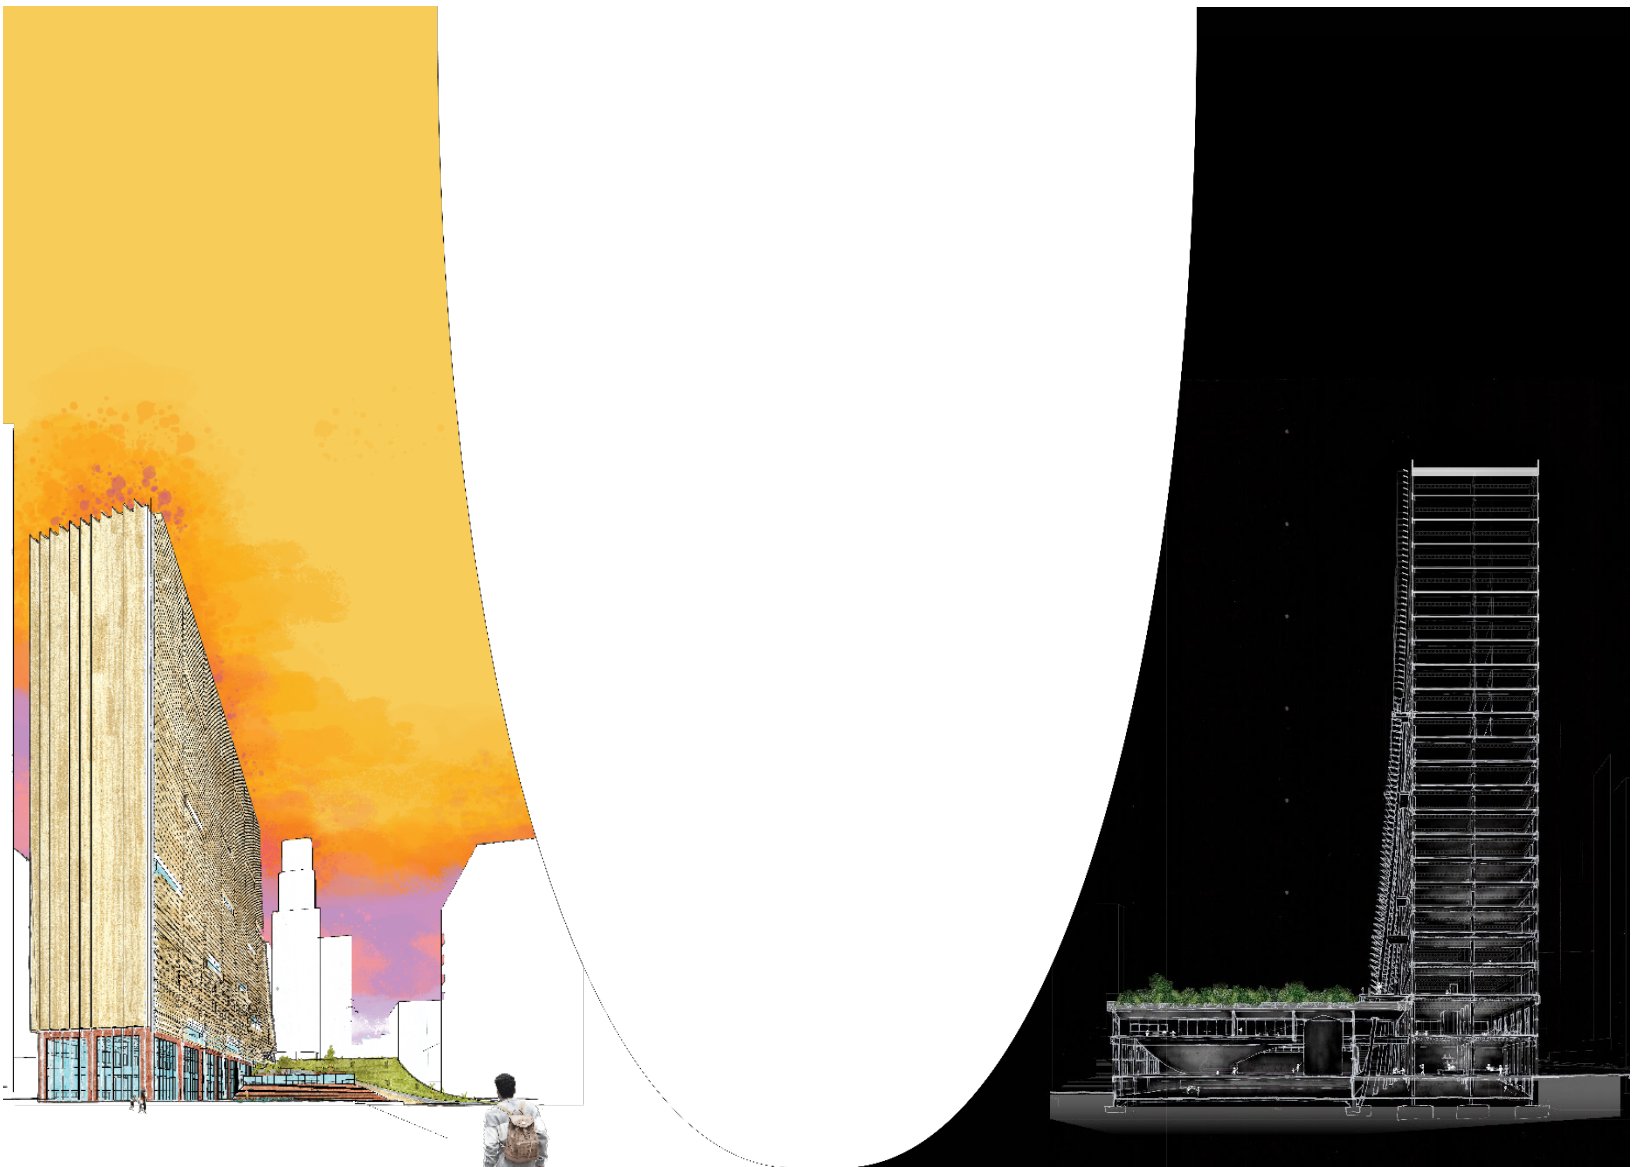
Pathway connecting ecology center with mixed use building featuring kinetic facade and bio pond
